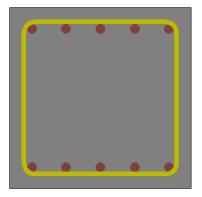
Cross section with reinforcement determined in [2] (10 No.9).
